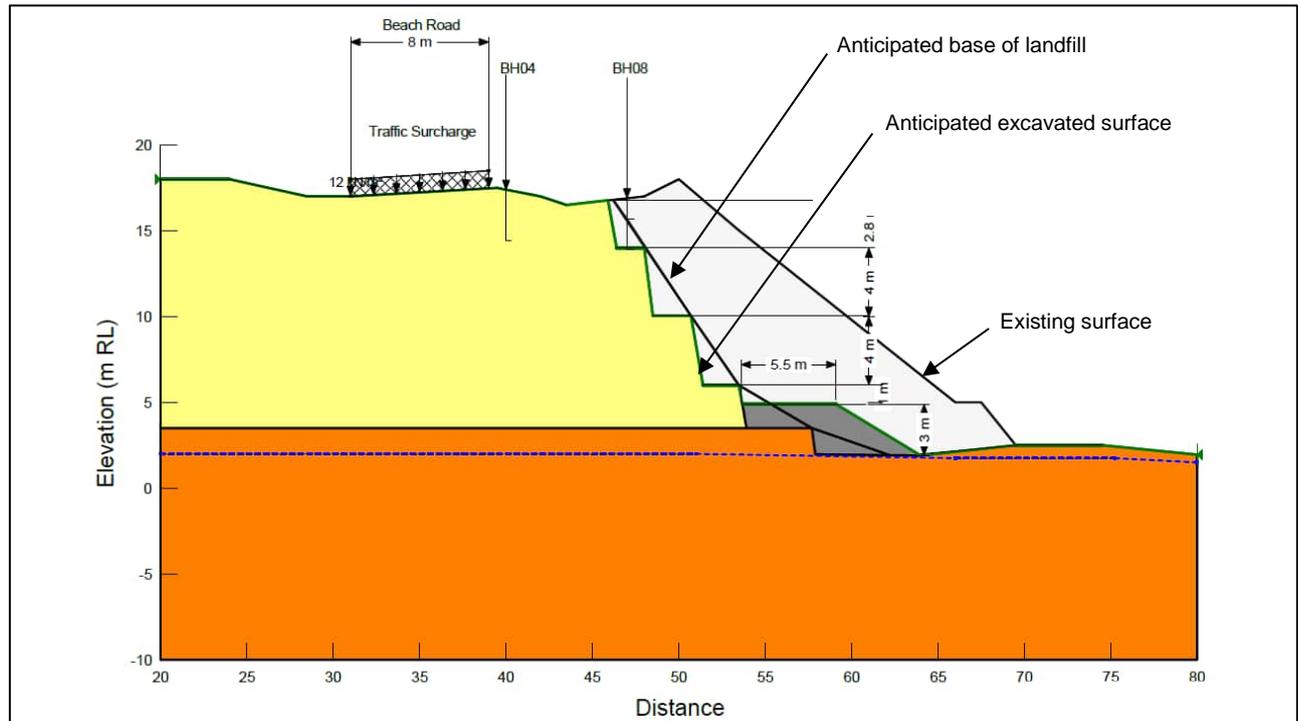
Landfill 2 proposed slopes (extract from slope stability results)
